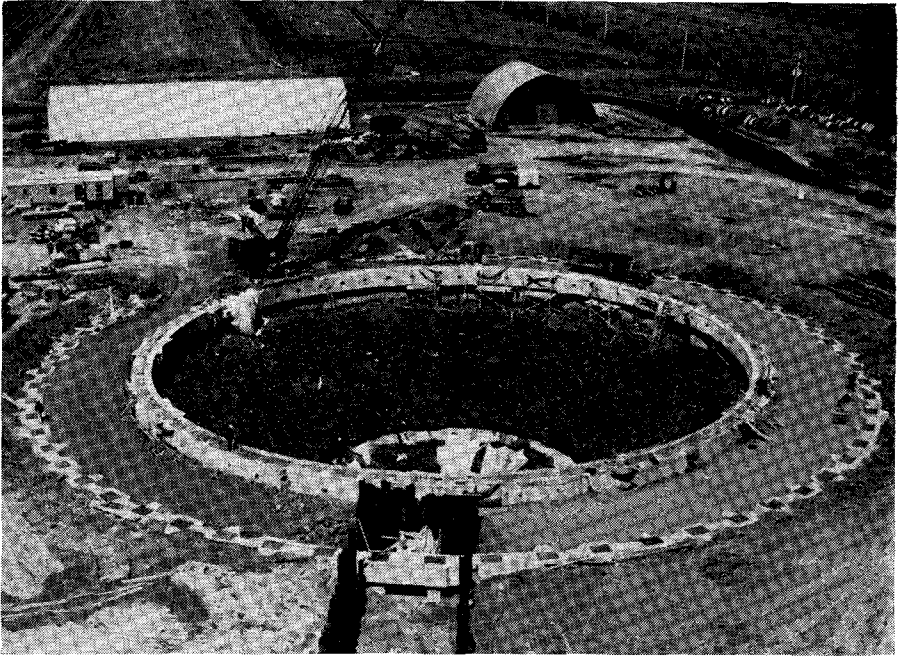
Completed foundation showing pile caps and inner ring beam.
